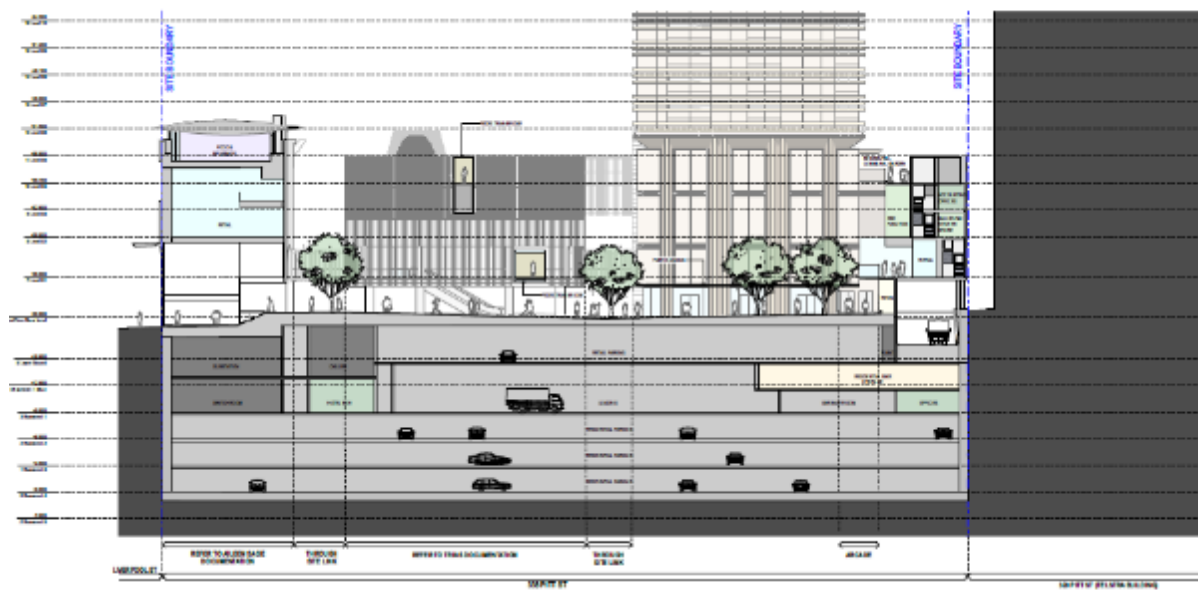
| Castlereagh Street frontage (Source: FJMT)
